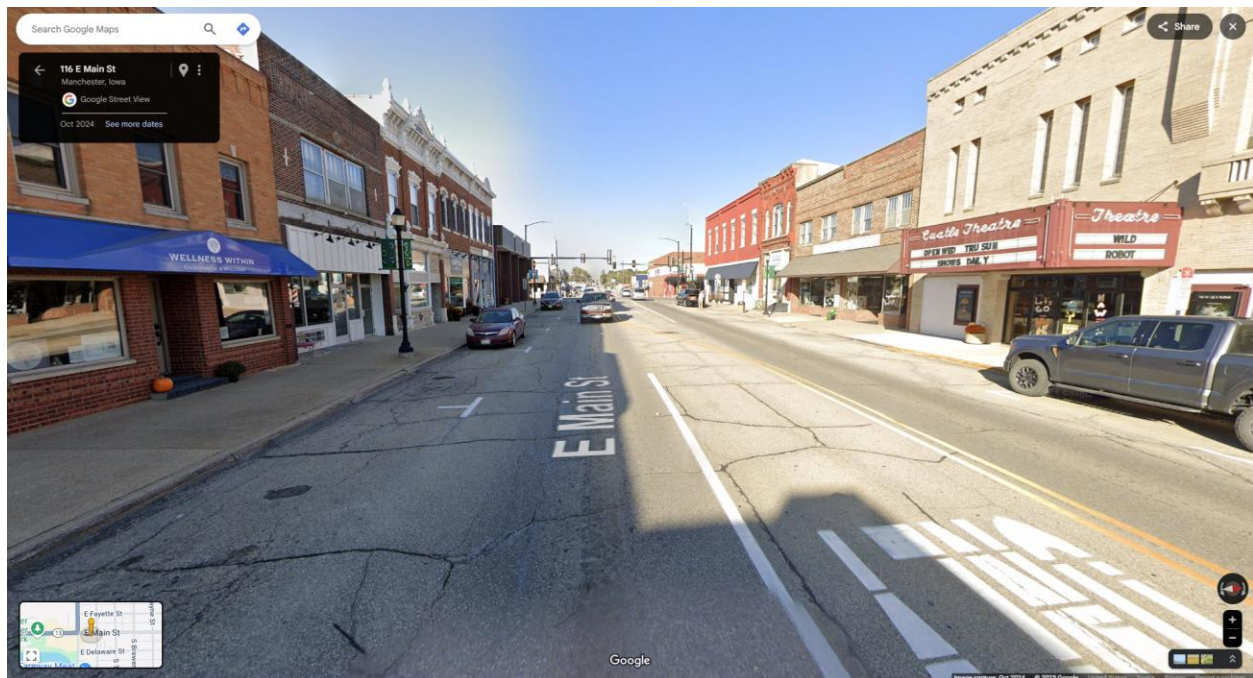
Main Street (Midblock): Franklin Street to Madison Street (Image Source: [Google](#))
